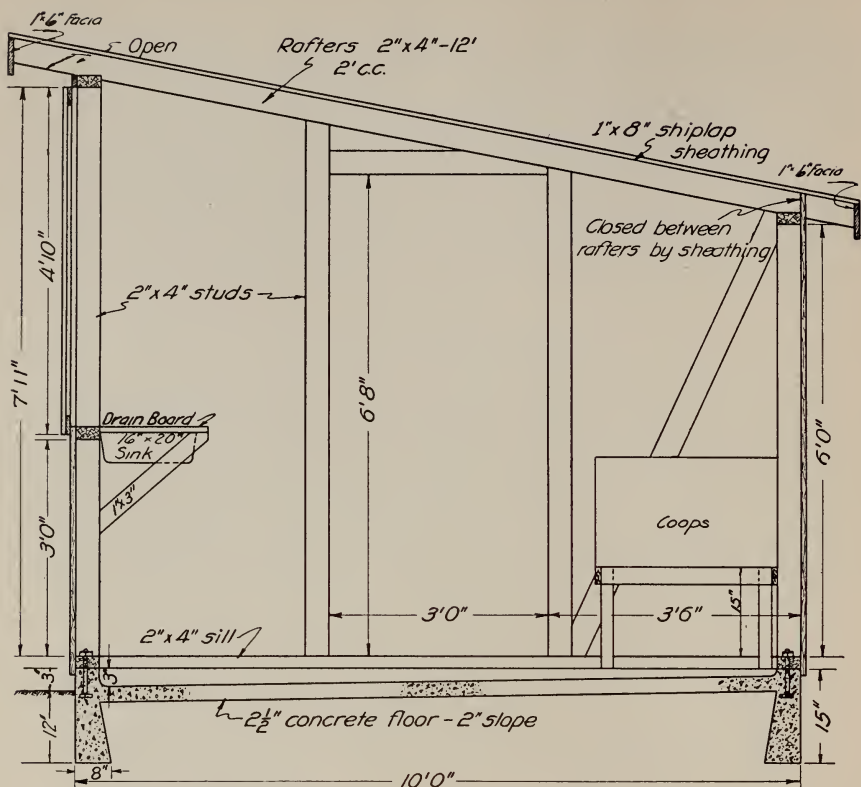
Cross section of hospital. Construction of this building is similar to that of the laying houses described on previous pages.
